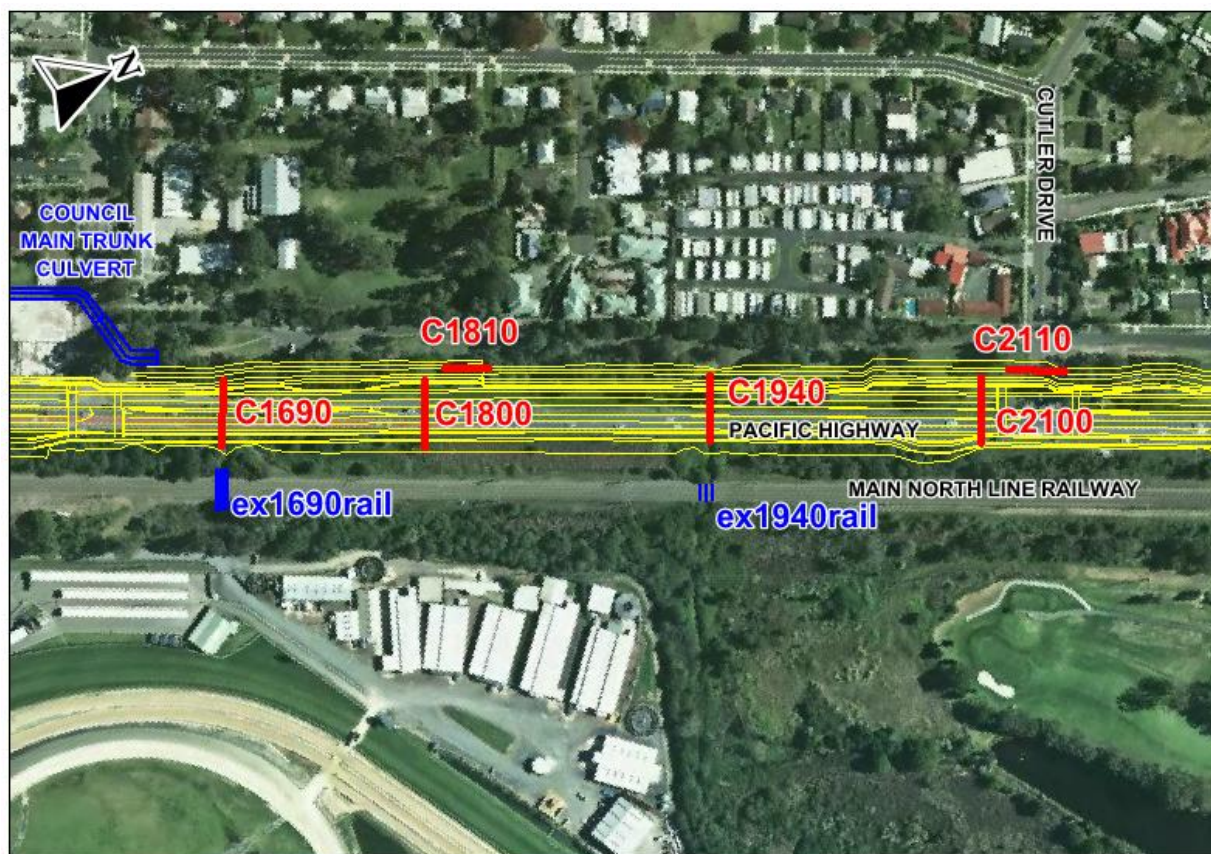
Plan arrangement of proposed Pacific Highway culverts
